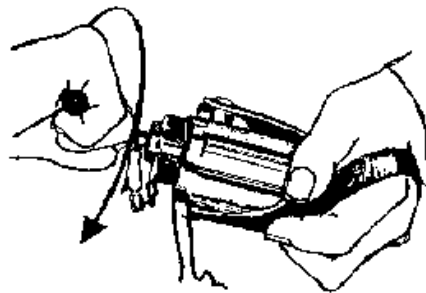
Holding & Operating a Twist-Type Blasting Machine.
